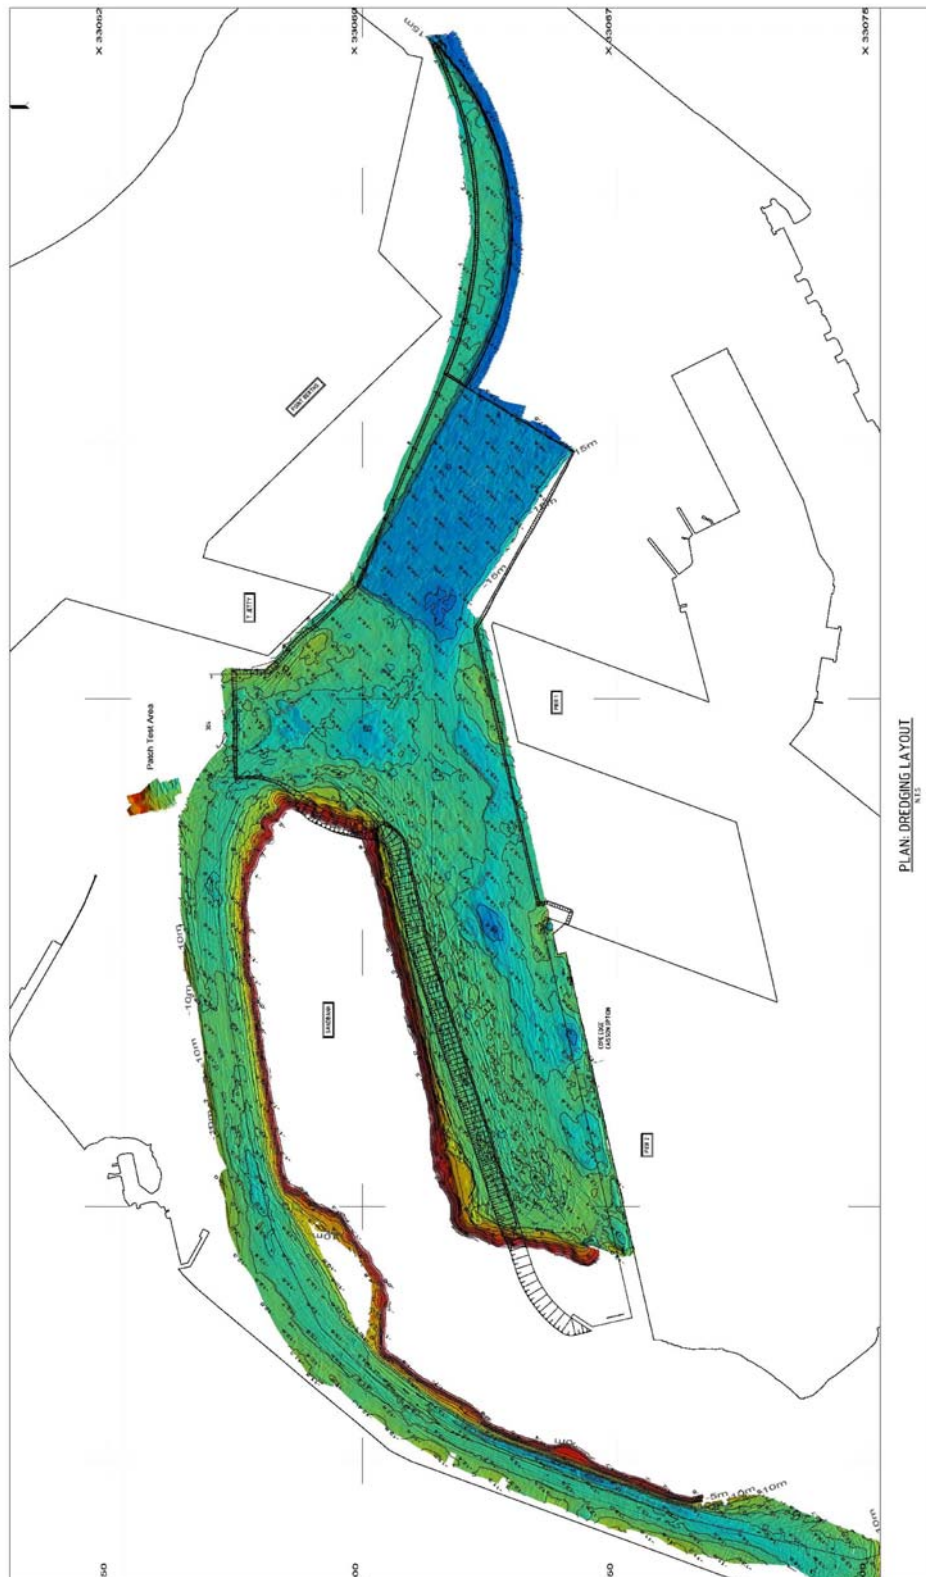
Port of Durban Pier 2 : Proposed Deepening of Berths 203 to 205
